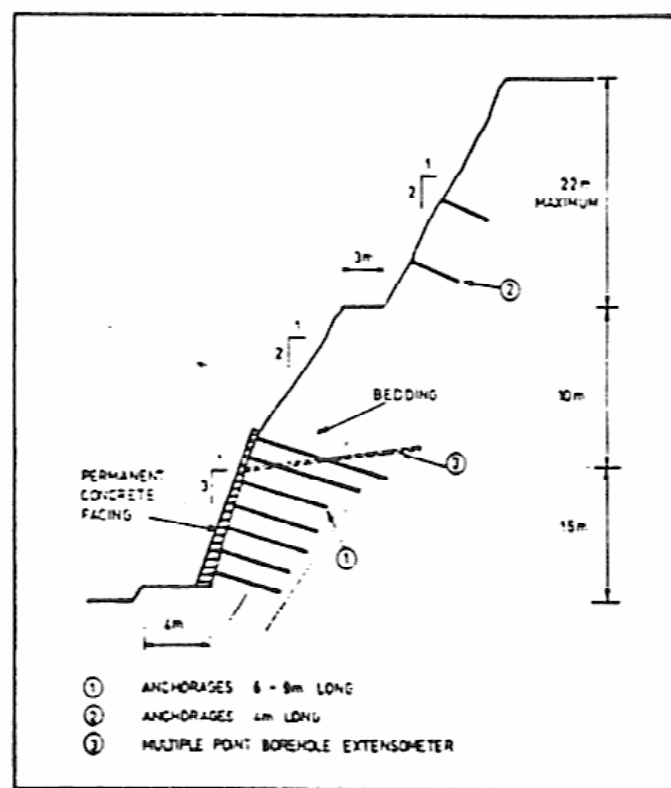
Retaining Wall Construction, A9 Autoroute, France (Bonazzi and Colombet, 1984)
